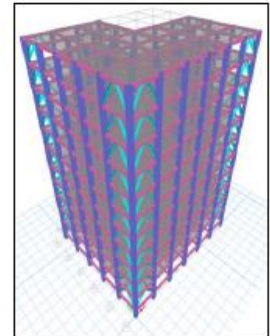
3D View of L Shaped building with Inverted V Bracing
